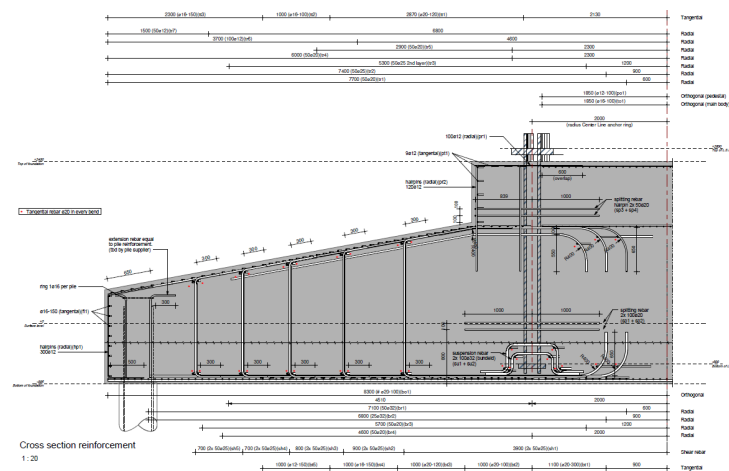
Cross section showing the reinforcement including all the reinforcement set names
